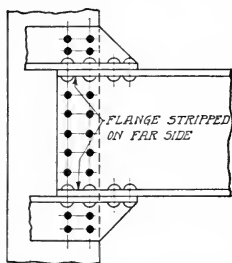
Connection of I-Beam to Flange of Column for Wind Bracing
